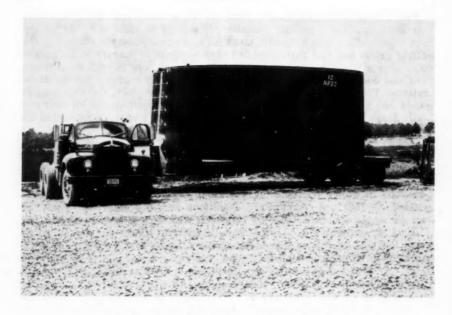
TRUCK TRAILER HAULING EQUIPMENT
